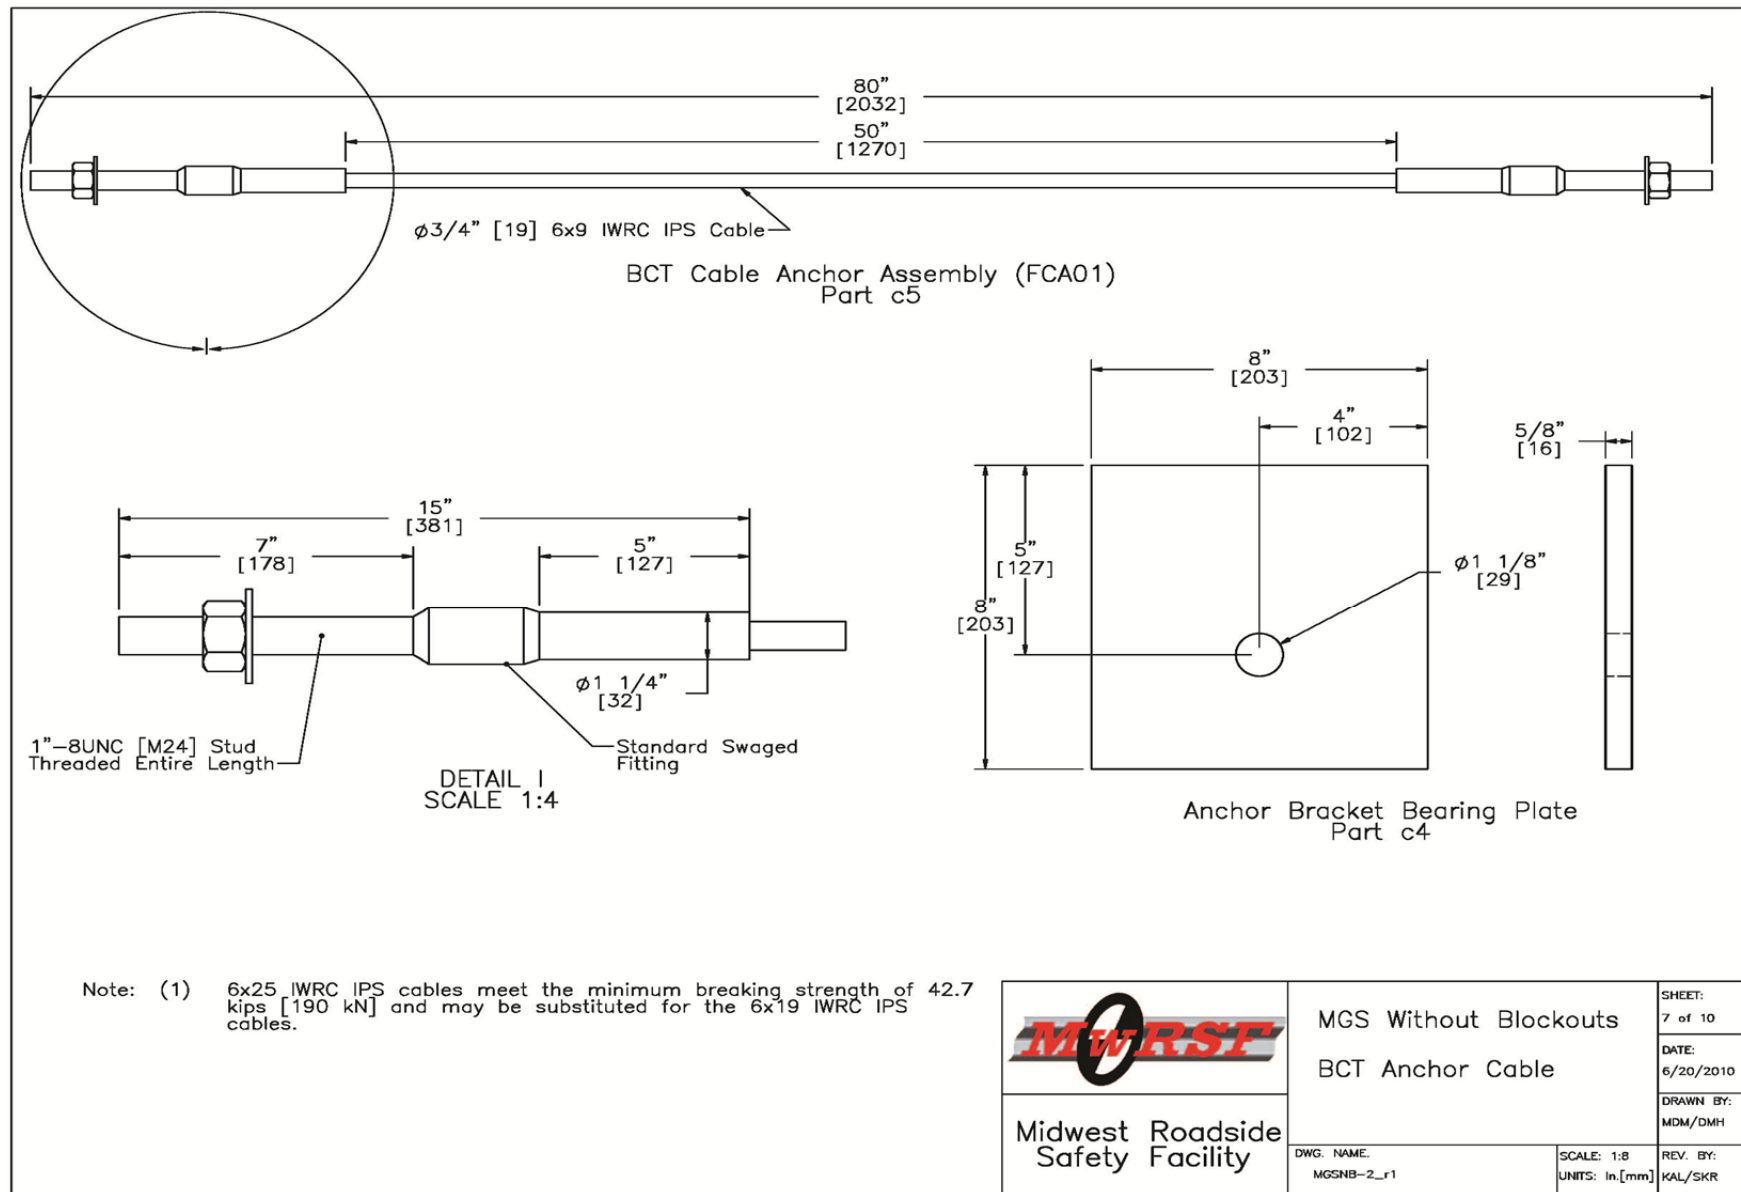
BCT Anchor Cable Details, Test No. MGSNB-2
